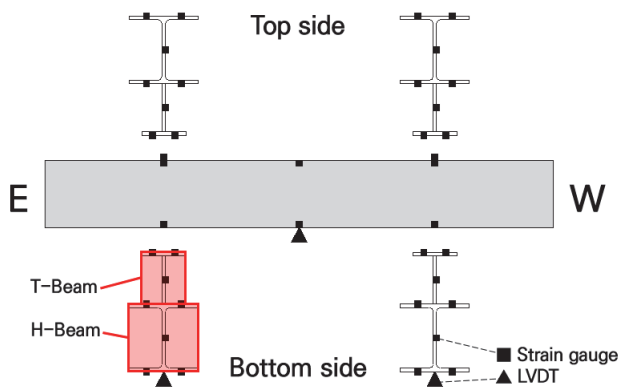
Installation of measuring instruments (Section view, short side, column is hidden)
